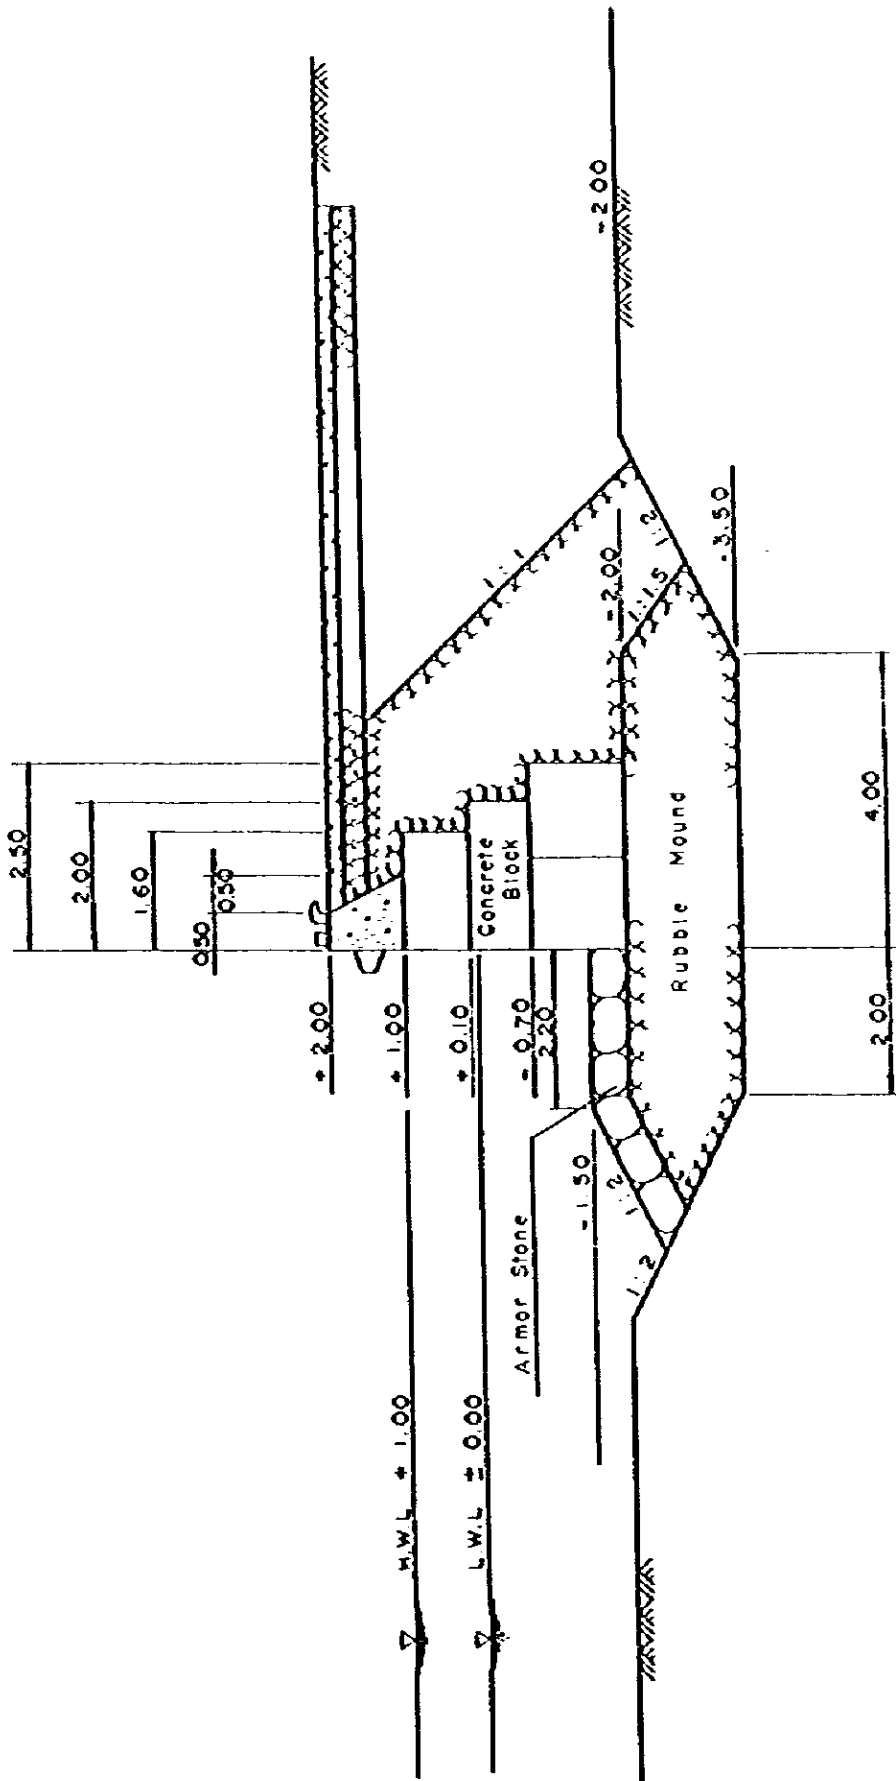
Typical Cross Section of -1.5m Wharf
